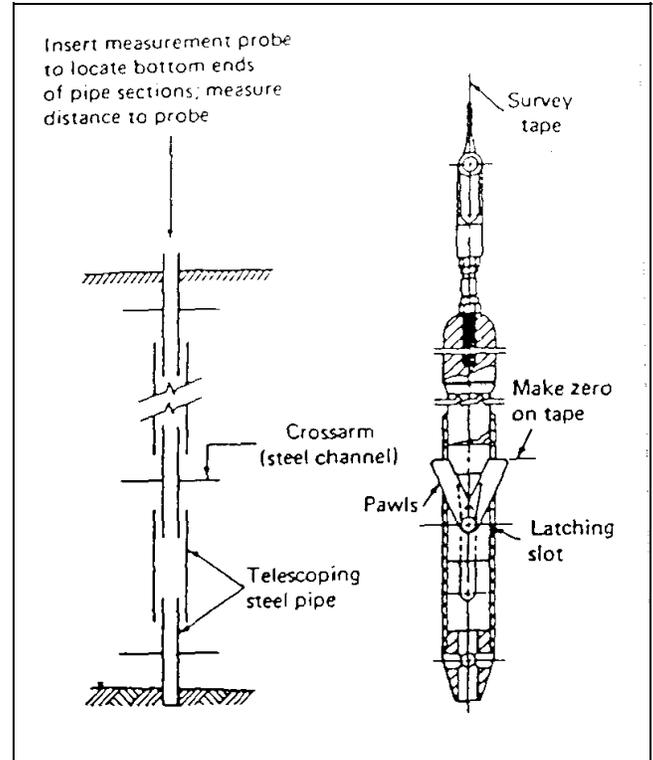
Crossarm gage: (a) Schematic of pipe arrangement and (b) measurement probe
